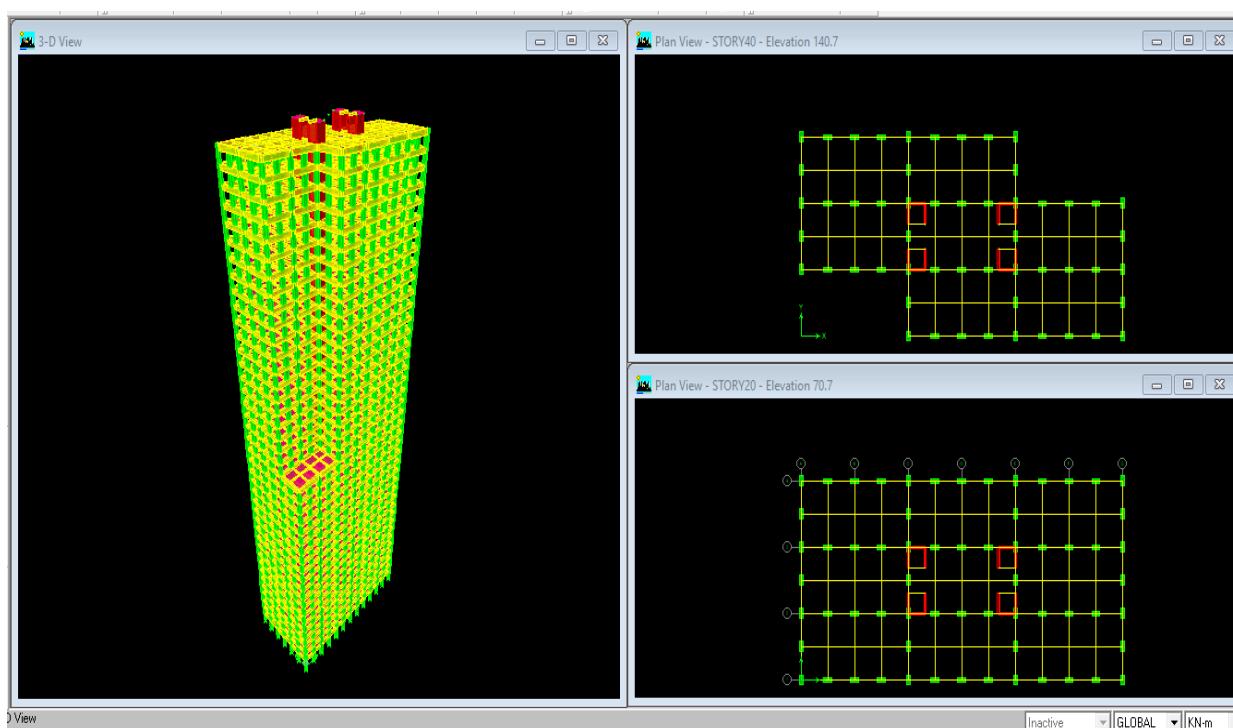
Plan view and 3-D view of 40 storied Bundled Tube structure building
